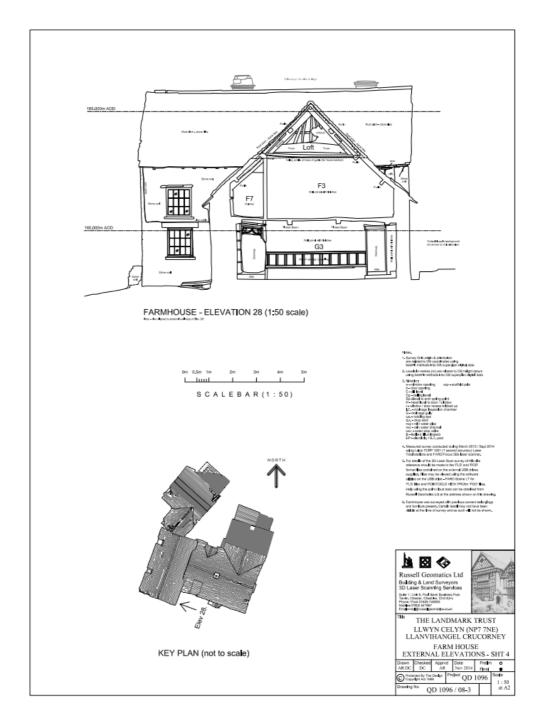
Cross-section through the Hall Range of the House, plus east elevation of Solar.
